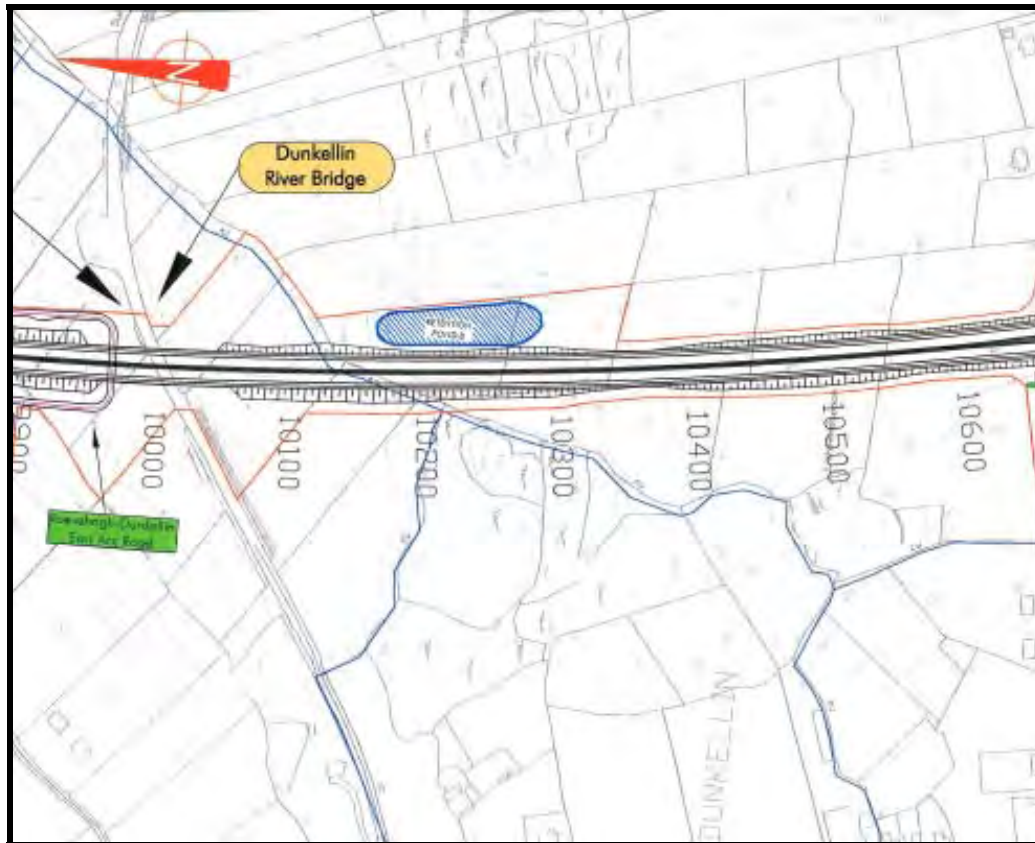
Location of Proposed N18 Road Scheme in the Study Area
